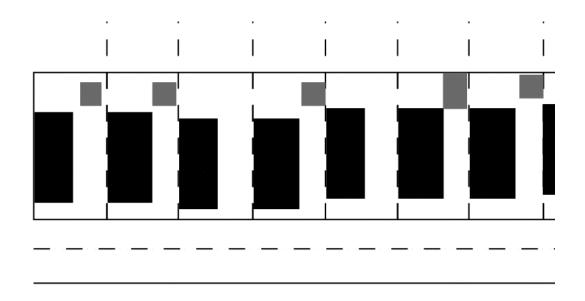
Plan Diagram of Housing Layouts, Charleston, SC by Author.
